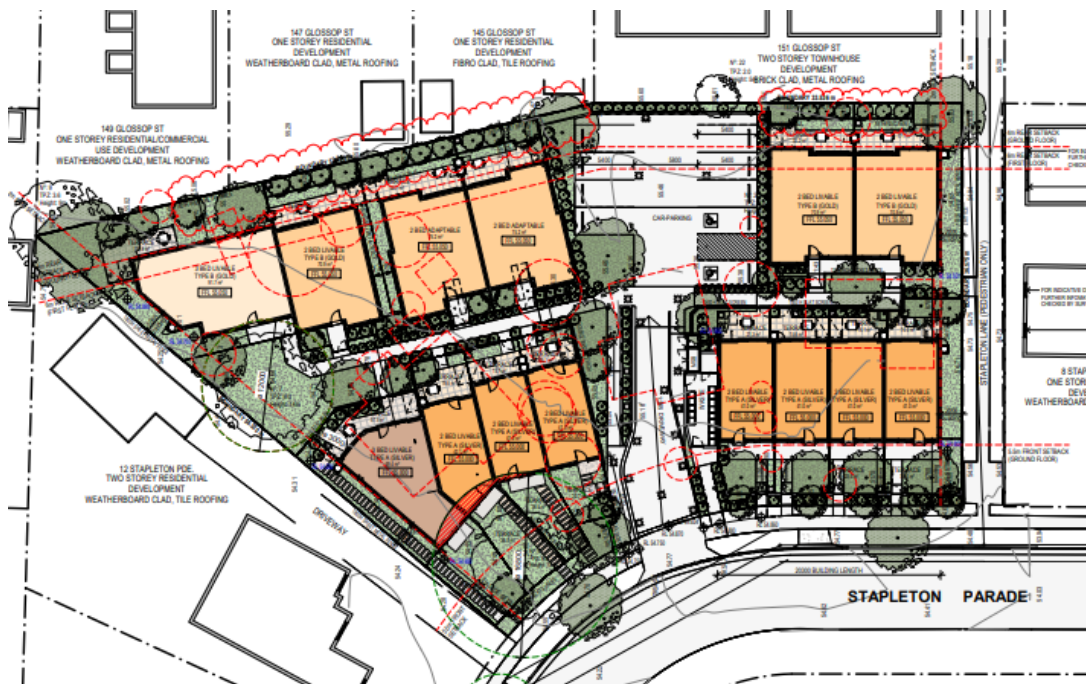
Extract from Architectural Plans – Proposed Site Plan (Source: Architectural Plans, Morson Group, dated 20/06/2023)
